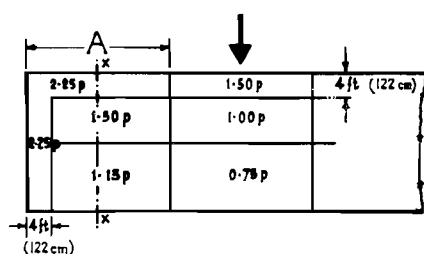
Roof plan of block of houses, showing distribution of external wind suctions to be assumed in the design of flat roofs of lightweight construction (wind normal to eaves). The dimension A indicates the length of the end house.
